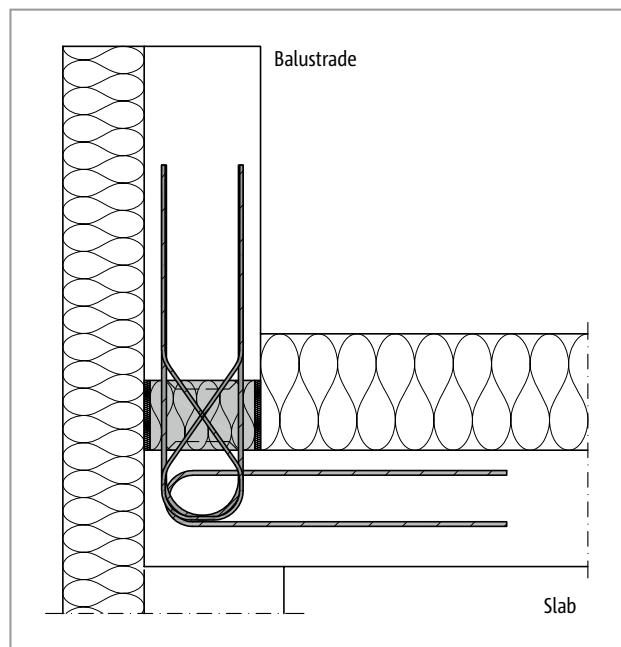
Schöck Isokorb® XT type A: Connection to a balustrade (XT type A-MM2)
